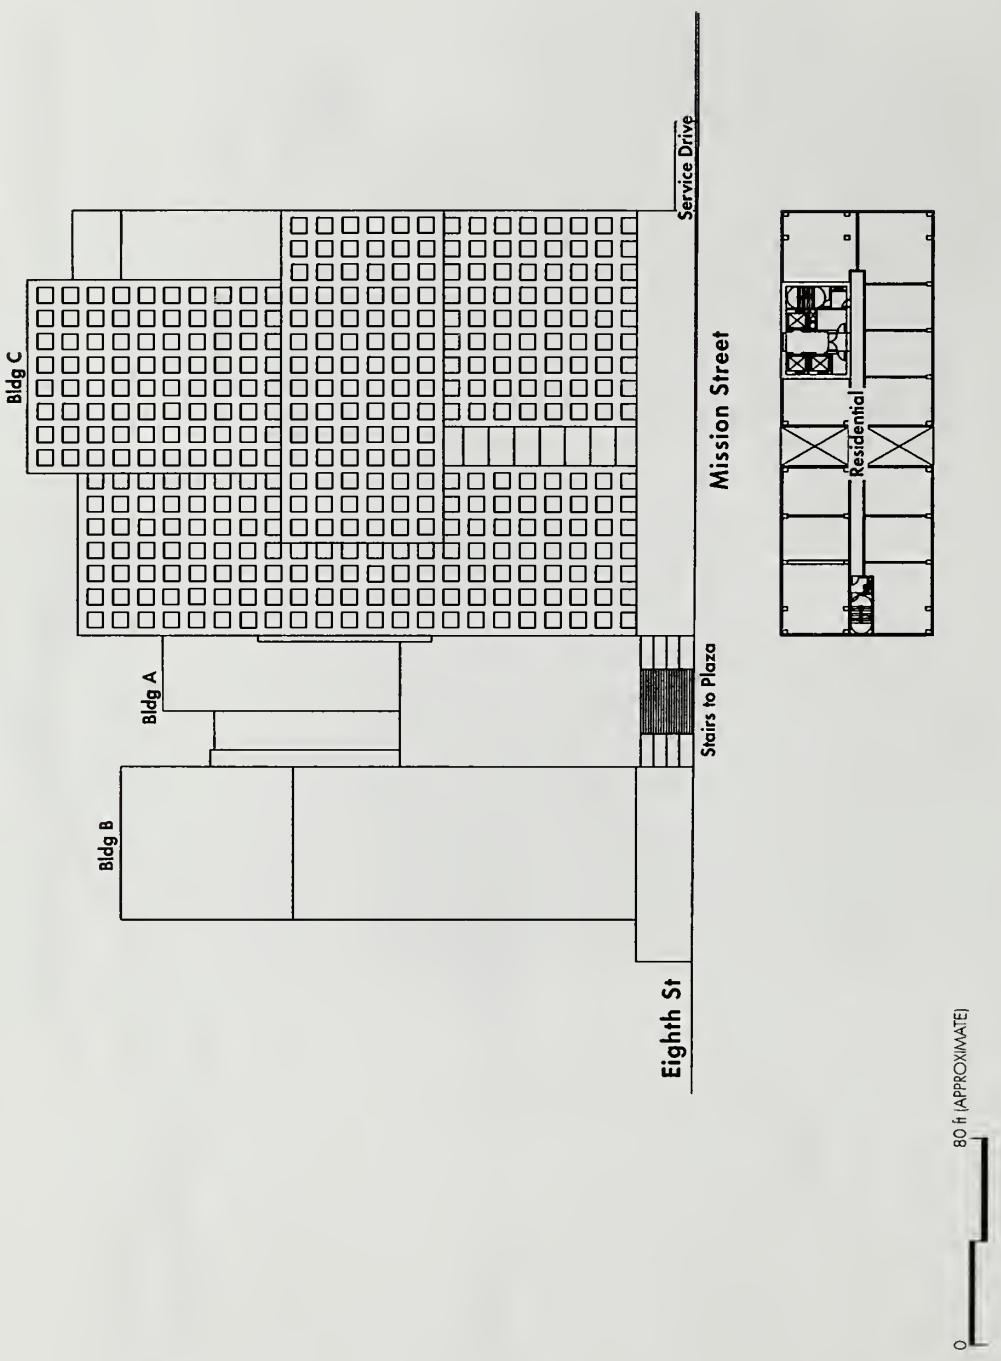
EIGHTH STREET ELEVATION AND TYPICAL FLOOR PLAN (BUILDING B)
